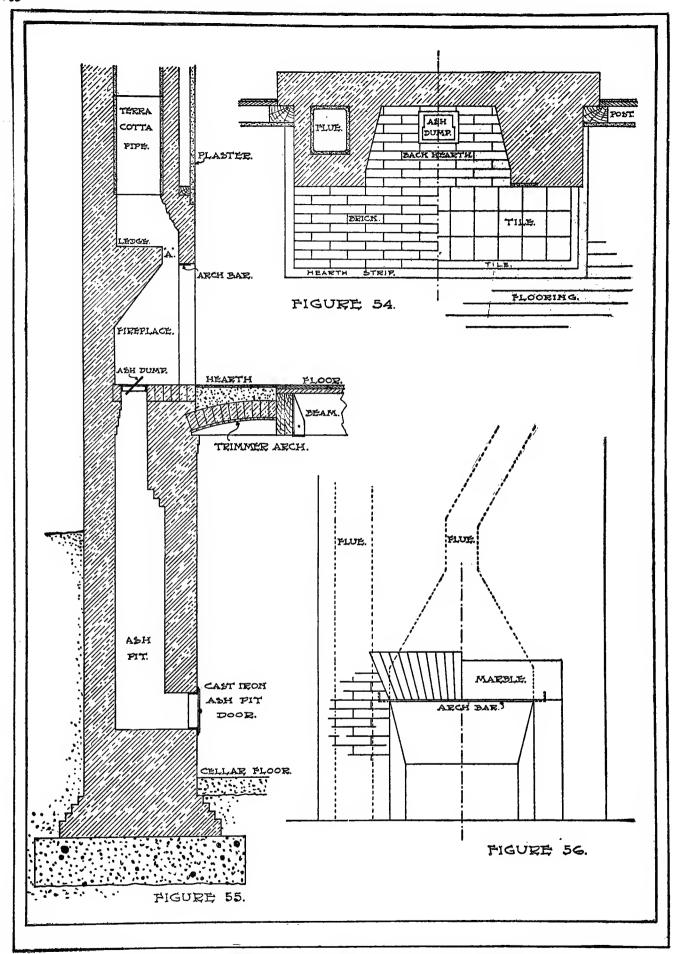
FIRE PLACE CONSTRUCTION—NON SMOKING
